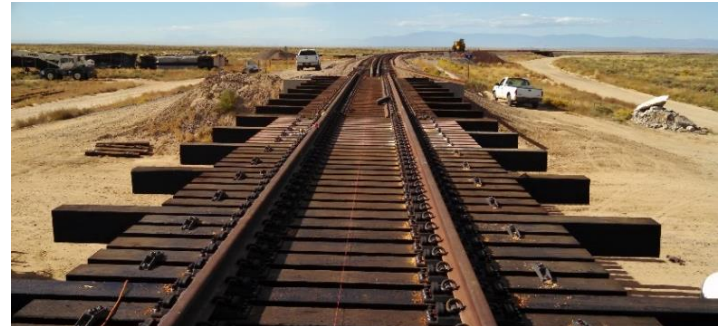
Locations of test tie types on the East Steel Bridge at FAST
